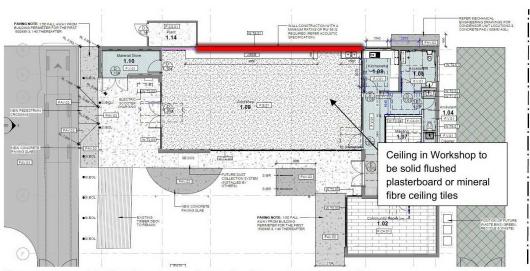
Location of R_w 55 wall construction (red) and replacement to workshop ceiling
